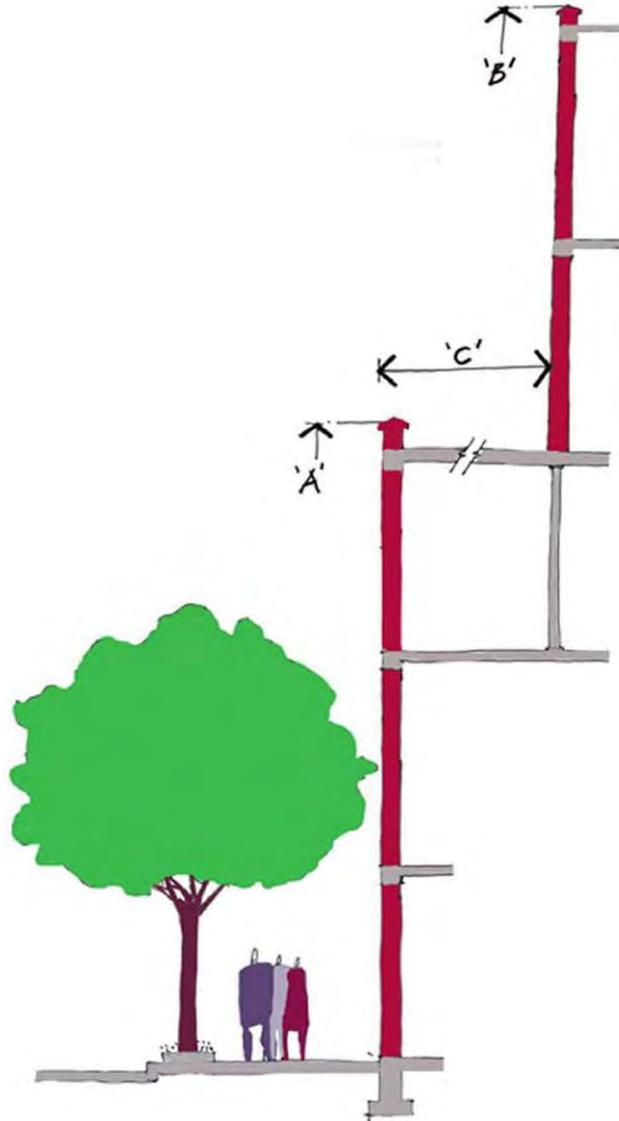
Illustrative Guidelines for Buildings Higher than Three Floors
